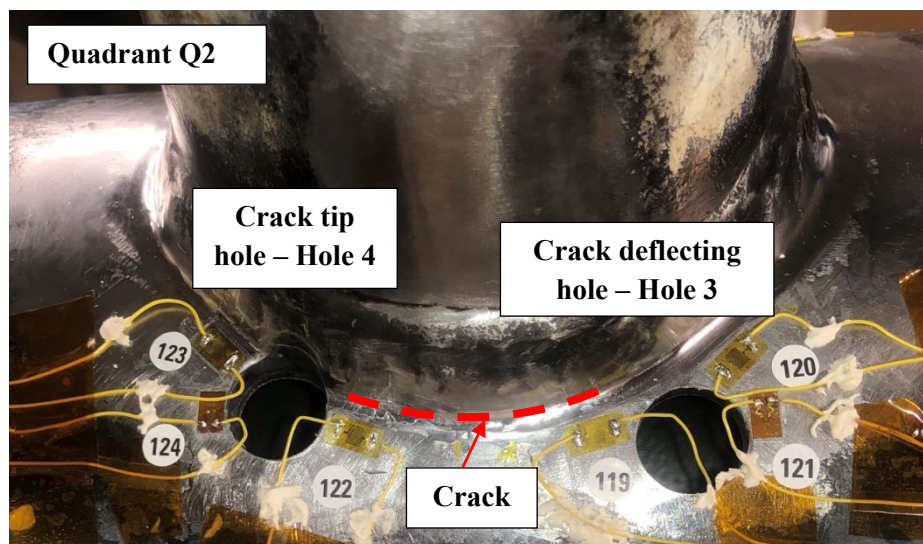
Quadrant Q2 repair, crack-tip hole on the left-hand side and crack deflecting hole on the right-hand side.
